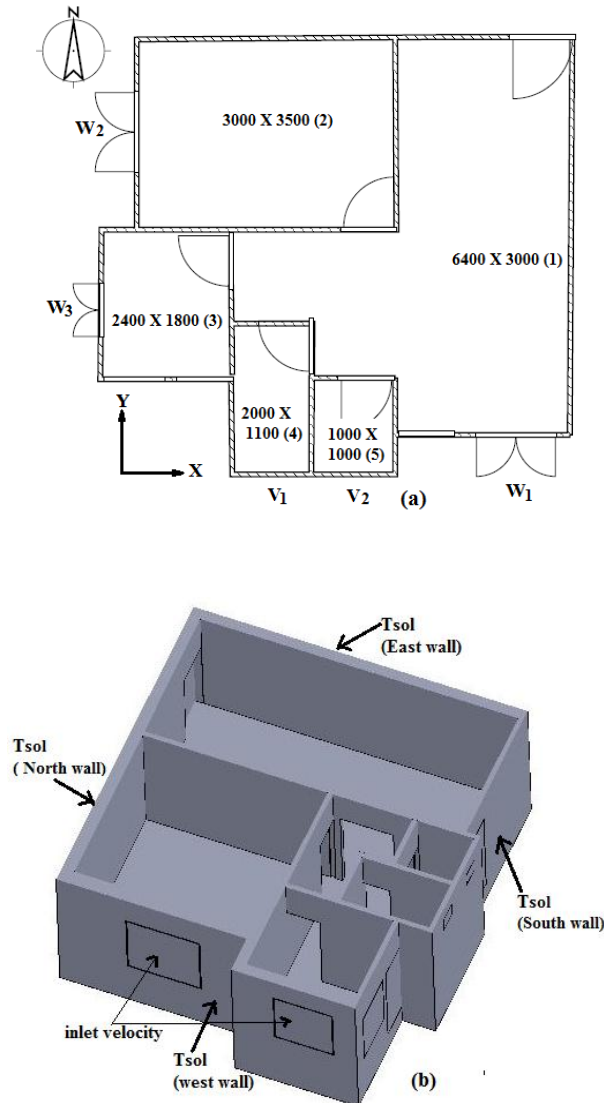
(a) The Layout of LIG house in C.G. prepared by housing board. (The dimensions are given by mm). 1. Living Room 2. Bed Room 3. Kitchen 4. Bathroom 5.Toilet (b) 3D model with boundary conditions.
